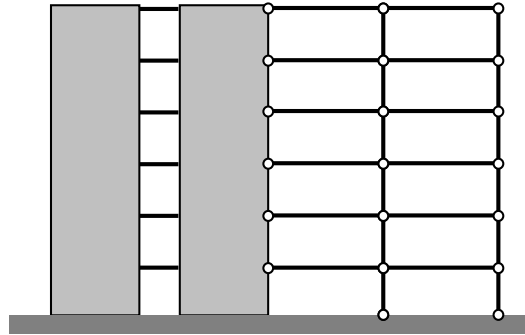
Example of conventional hybrid coupled shear wall system connected to a gravity-resisting steel frame with pinned beam-to-column joints.
